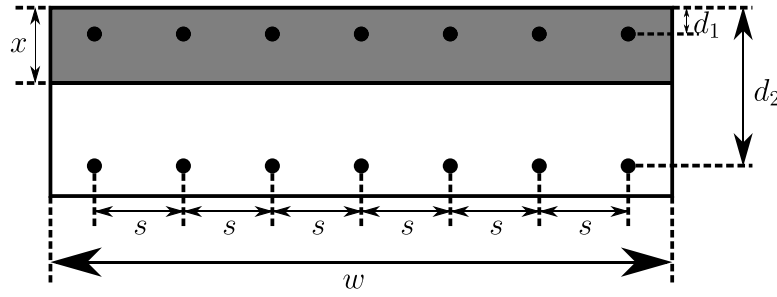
Sketch of the cross-section of the panel used in the model of reinforced concrete. The shaded area indicates concrete in compression.
